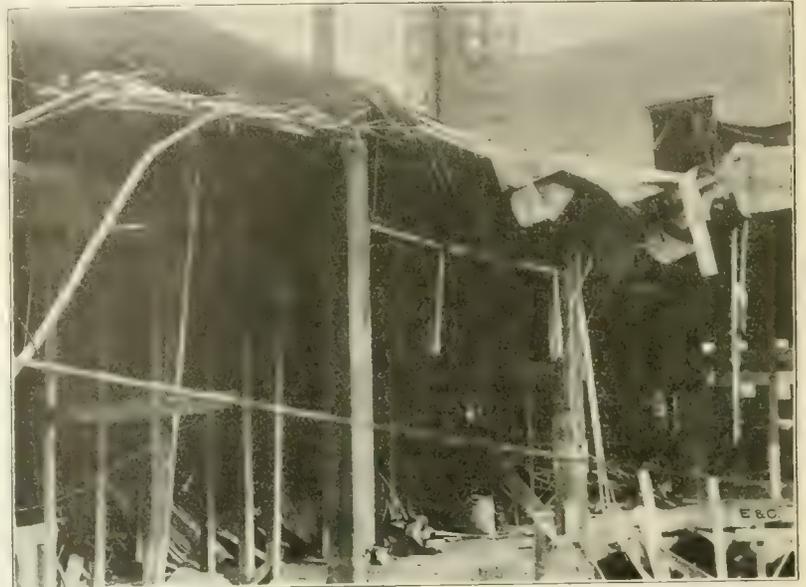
View of Wrecked Portion of Theater and Arcade Building—Note Squareness of Girder Fracture—See Fig. 1 for Location of Camera.
